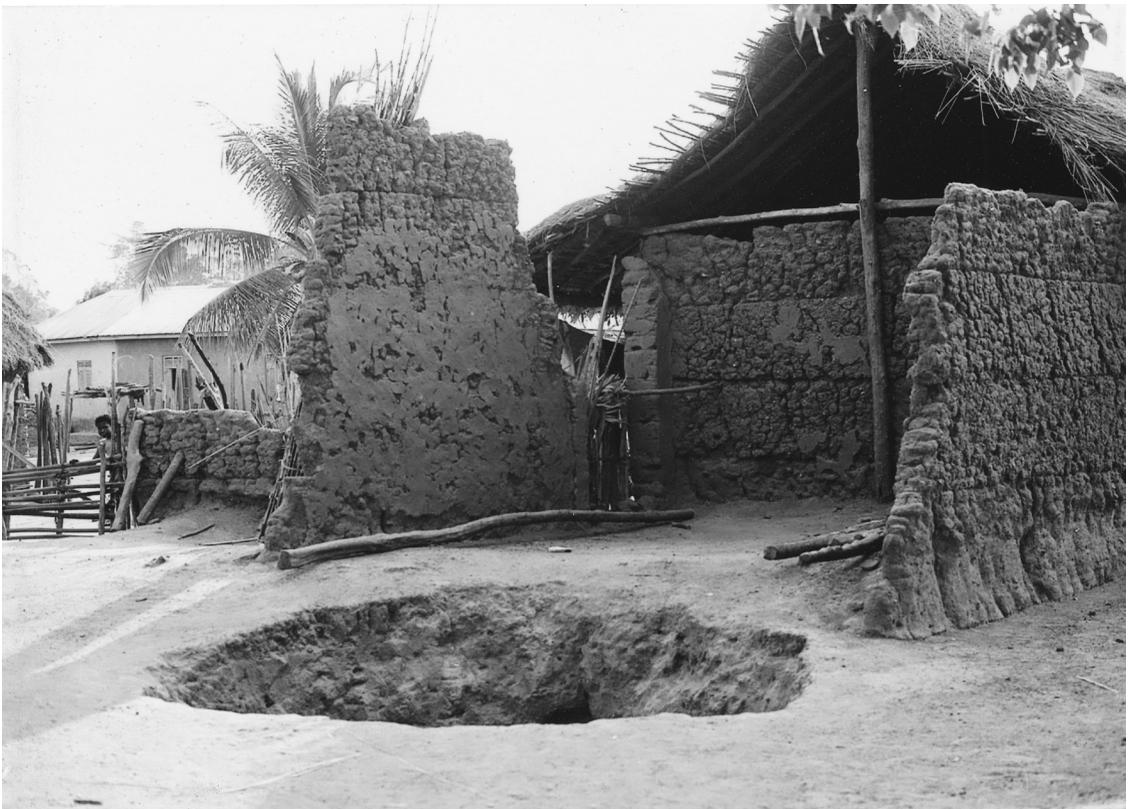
Hani, borrow pit beside the *swish* walls of an abandoned room. (Photo by author, 1975.)
